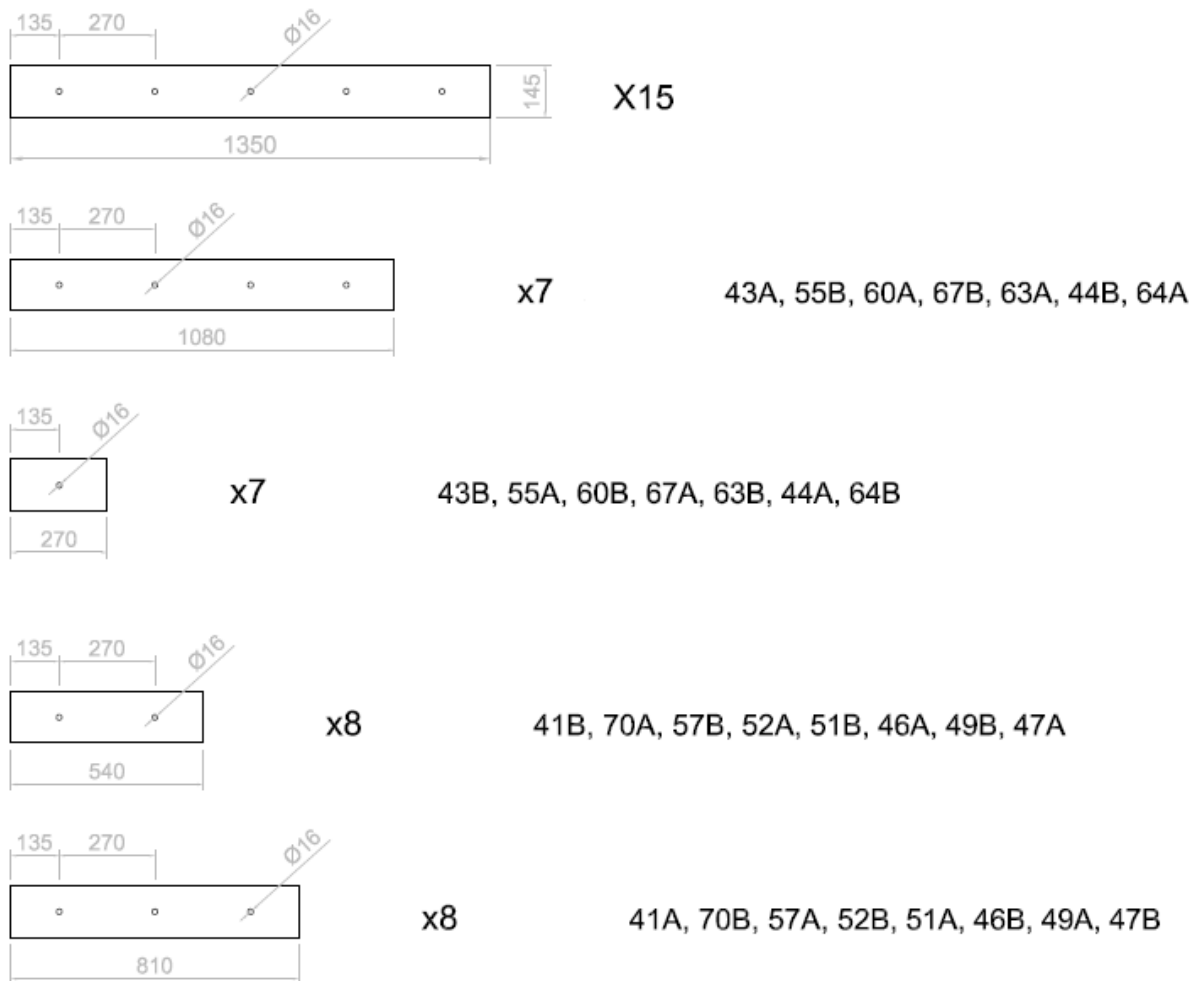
Laminations used for the second in plane shear test made in the square SLTD. These is the cuts used to get a 1 in 8 butt joint pattern. The dimensions of each lamination used to compose the deck are showed. It means that the deck in this test was composed by 15 laminations of 1350mm, 7 laminations of 1080mm, 7 laminations of 270mm, 8 laminations of 540mm, 8 laminations of 810mm and 5 steel bars of $\text{Ø}16\text{mm}$
